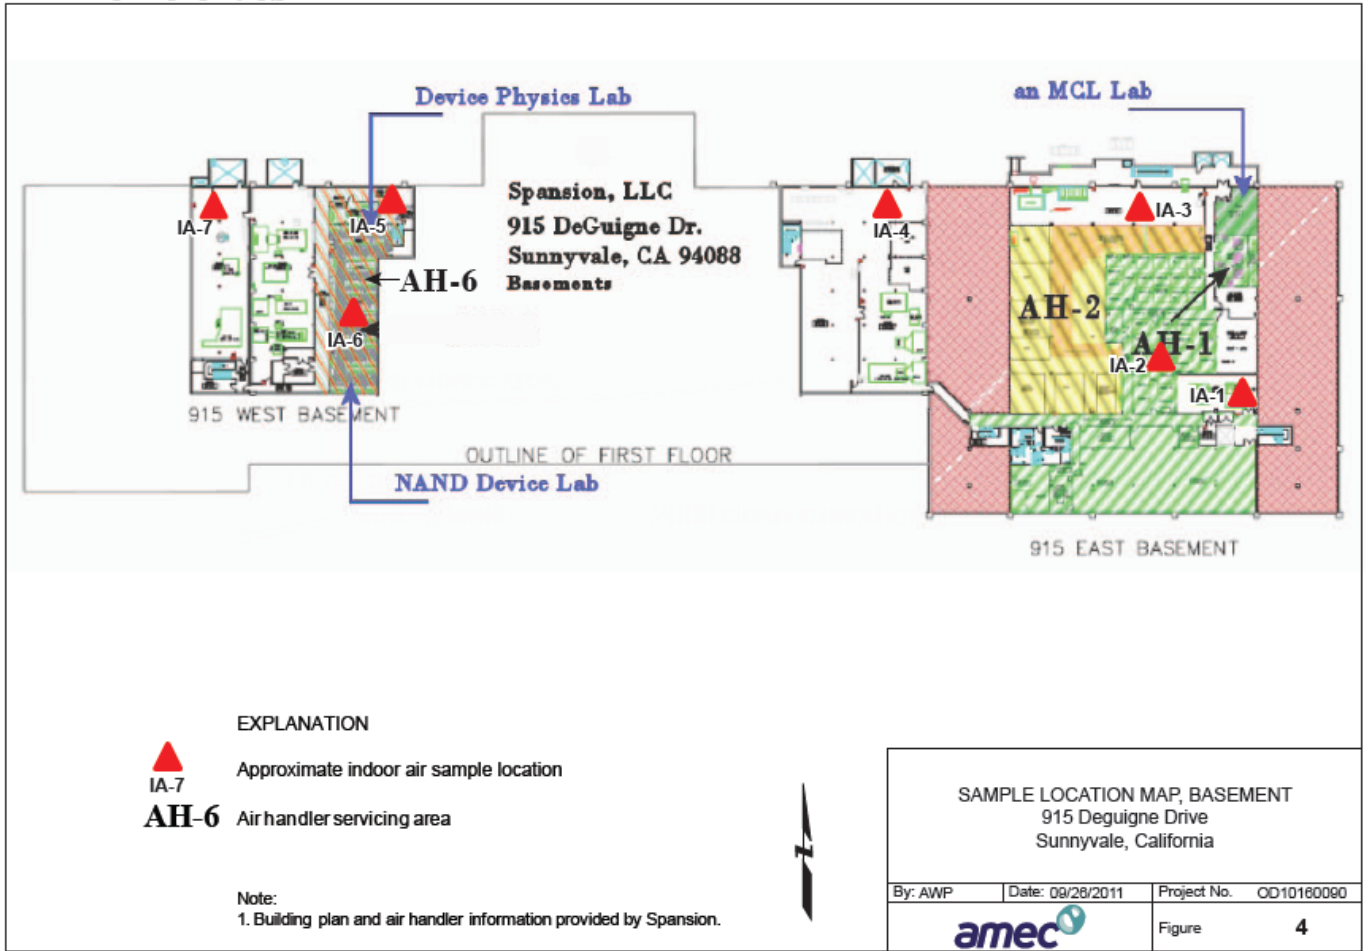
915 DeGuigne building basement indoor air testing locations
